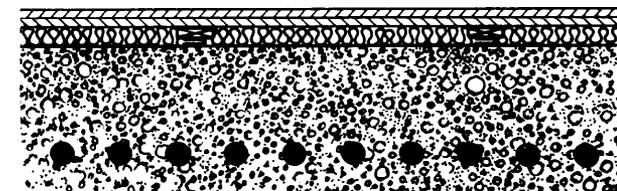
WALL AND PARTITION CONSTRUCTION, NOISE CONTROL
